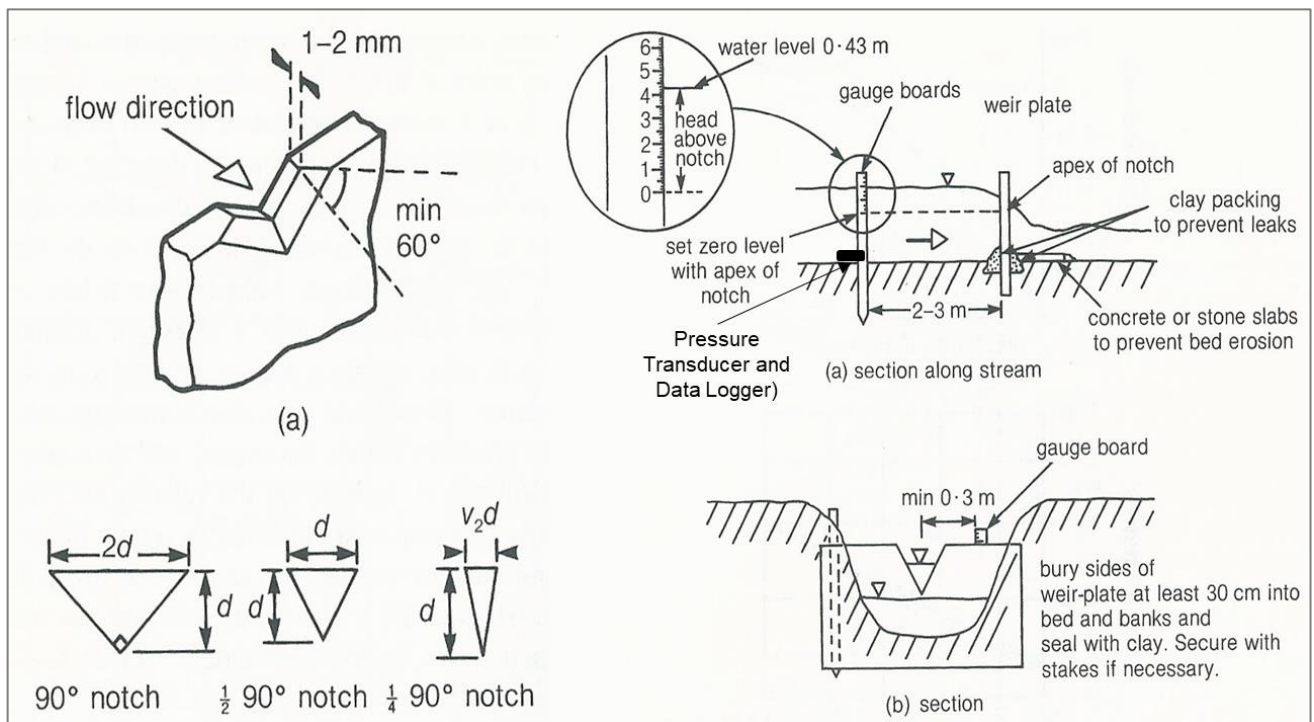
Notch dimensions and installation arrangements (from Brassington, 2007)
